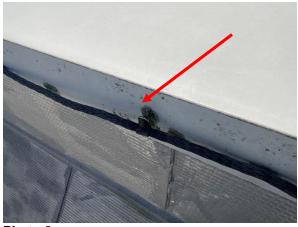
Roof – View of isolated fastener holes at surge protection – Isolated.
